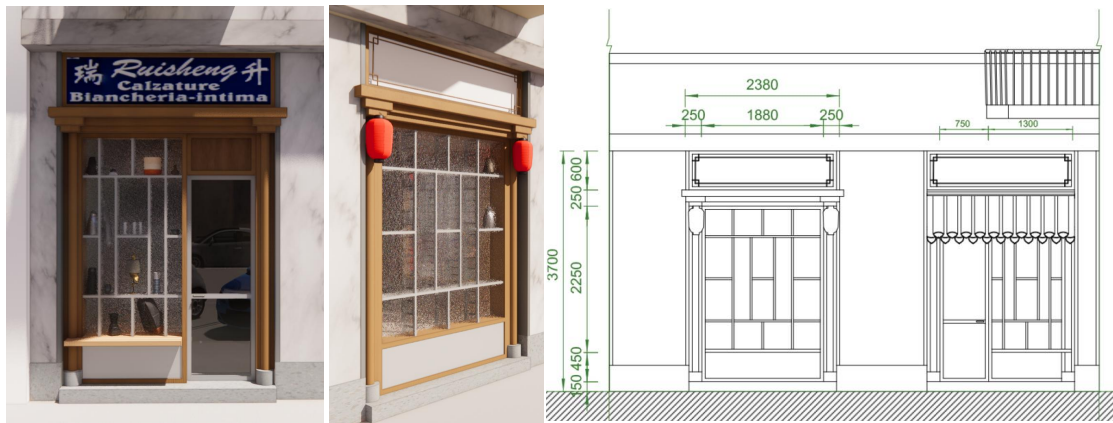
Shop Façade Renovation Type I (Drawn by the Author)
